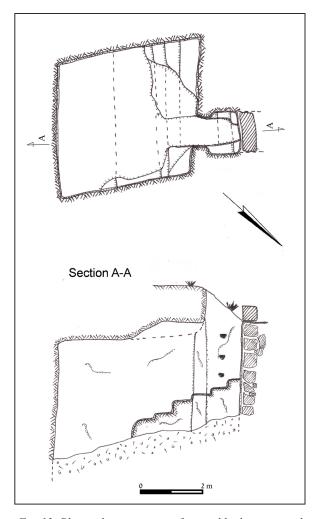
Plan and cross-section of a ritual bath repurposed as a cistern (no. 1, photo: Boaz Zissu)
